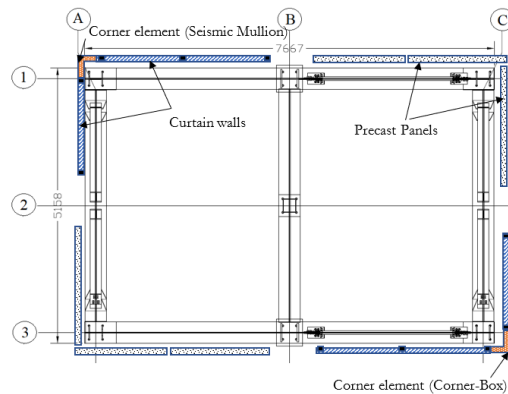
Plan view of precast panels and curtain wall assembly on top two floors of structure
